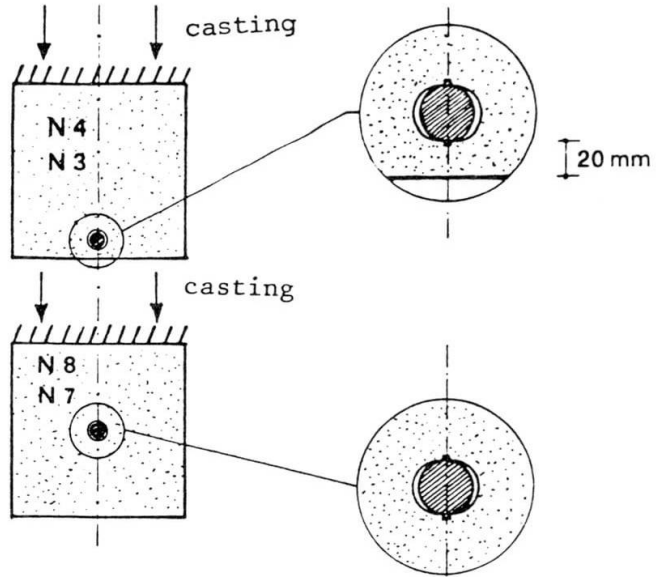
b - Transversal cross-sections of the test specimens and orientation of the lugs
